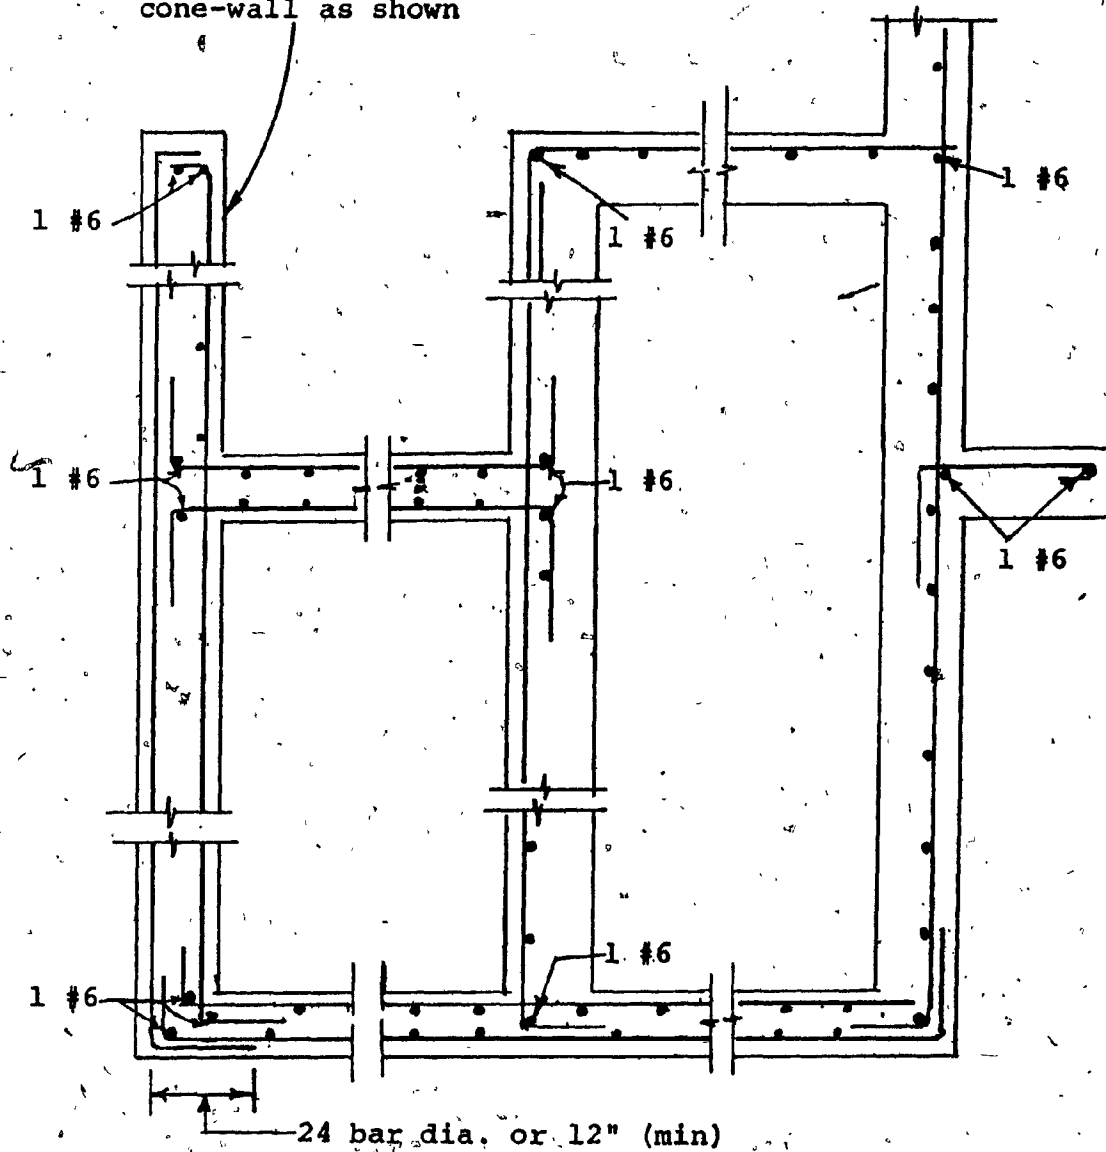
Plan View Showing Typical Wall Reinforcement Detail
